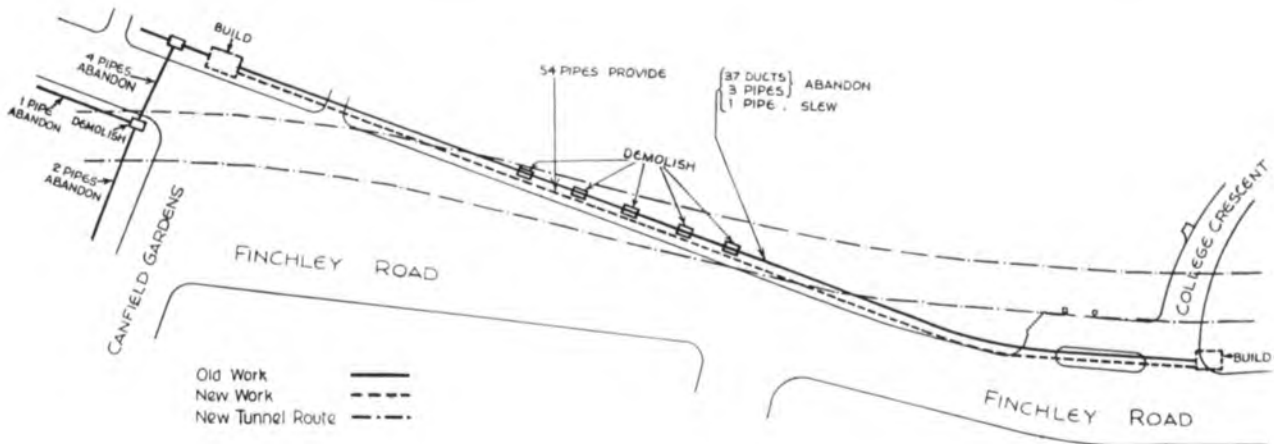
PLAN OF THE FINCHLEY ROAD DIVERSION.
